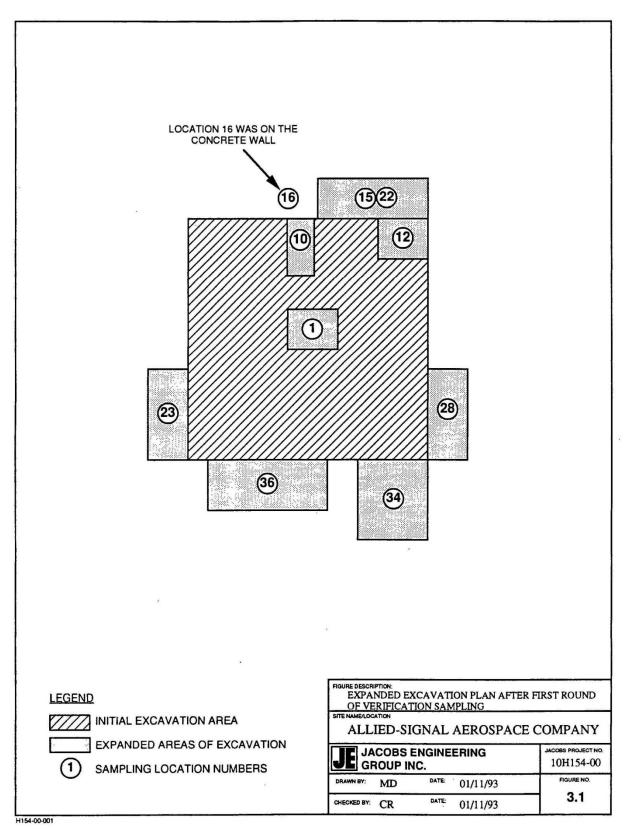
Expanded Excavation Plan After First Round of Verification Sampling
